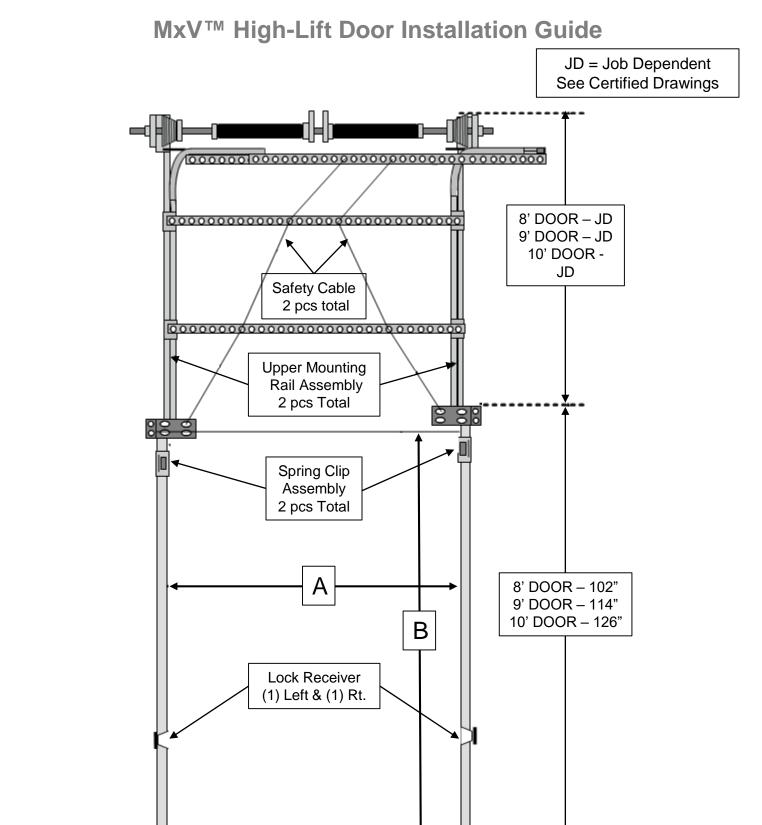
Key Measurements and Locations of Mounting Rails and Bearing Assemblies
